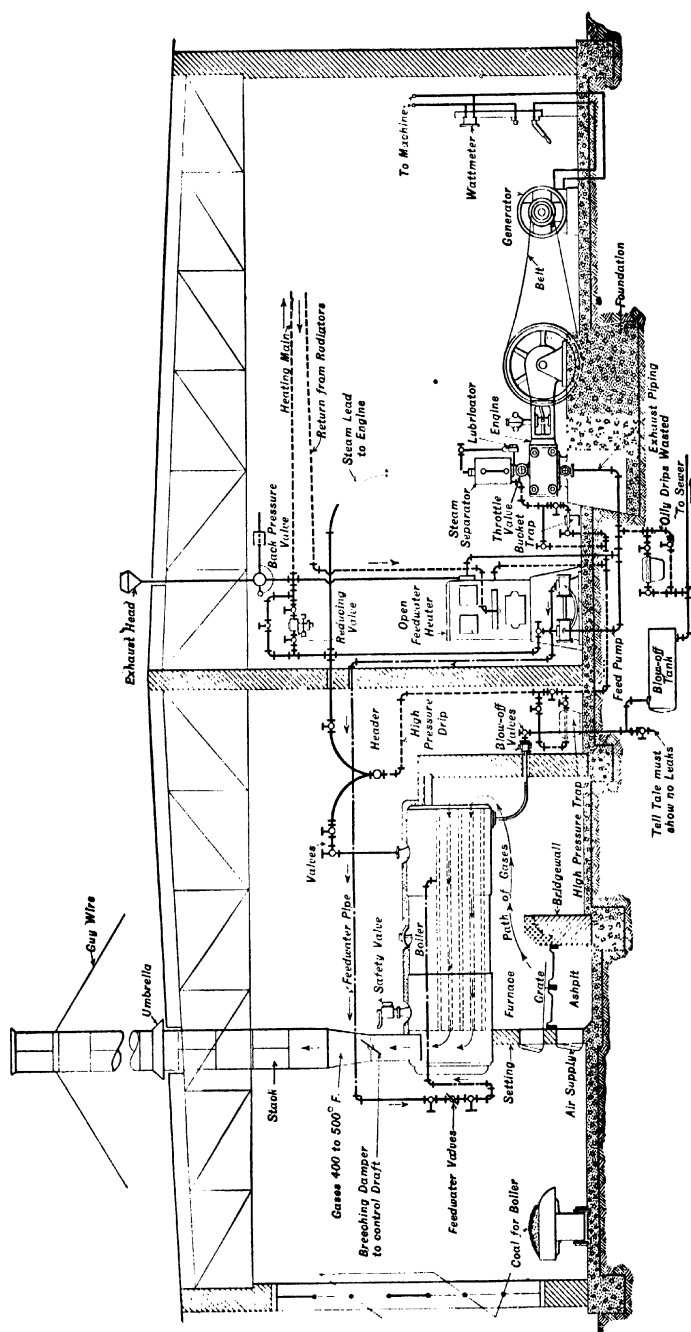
Non-condensing Isolated Steam Power Plant.
